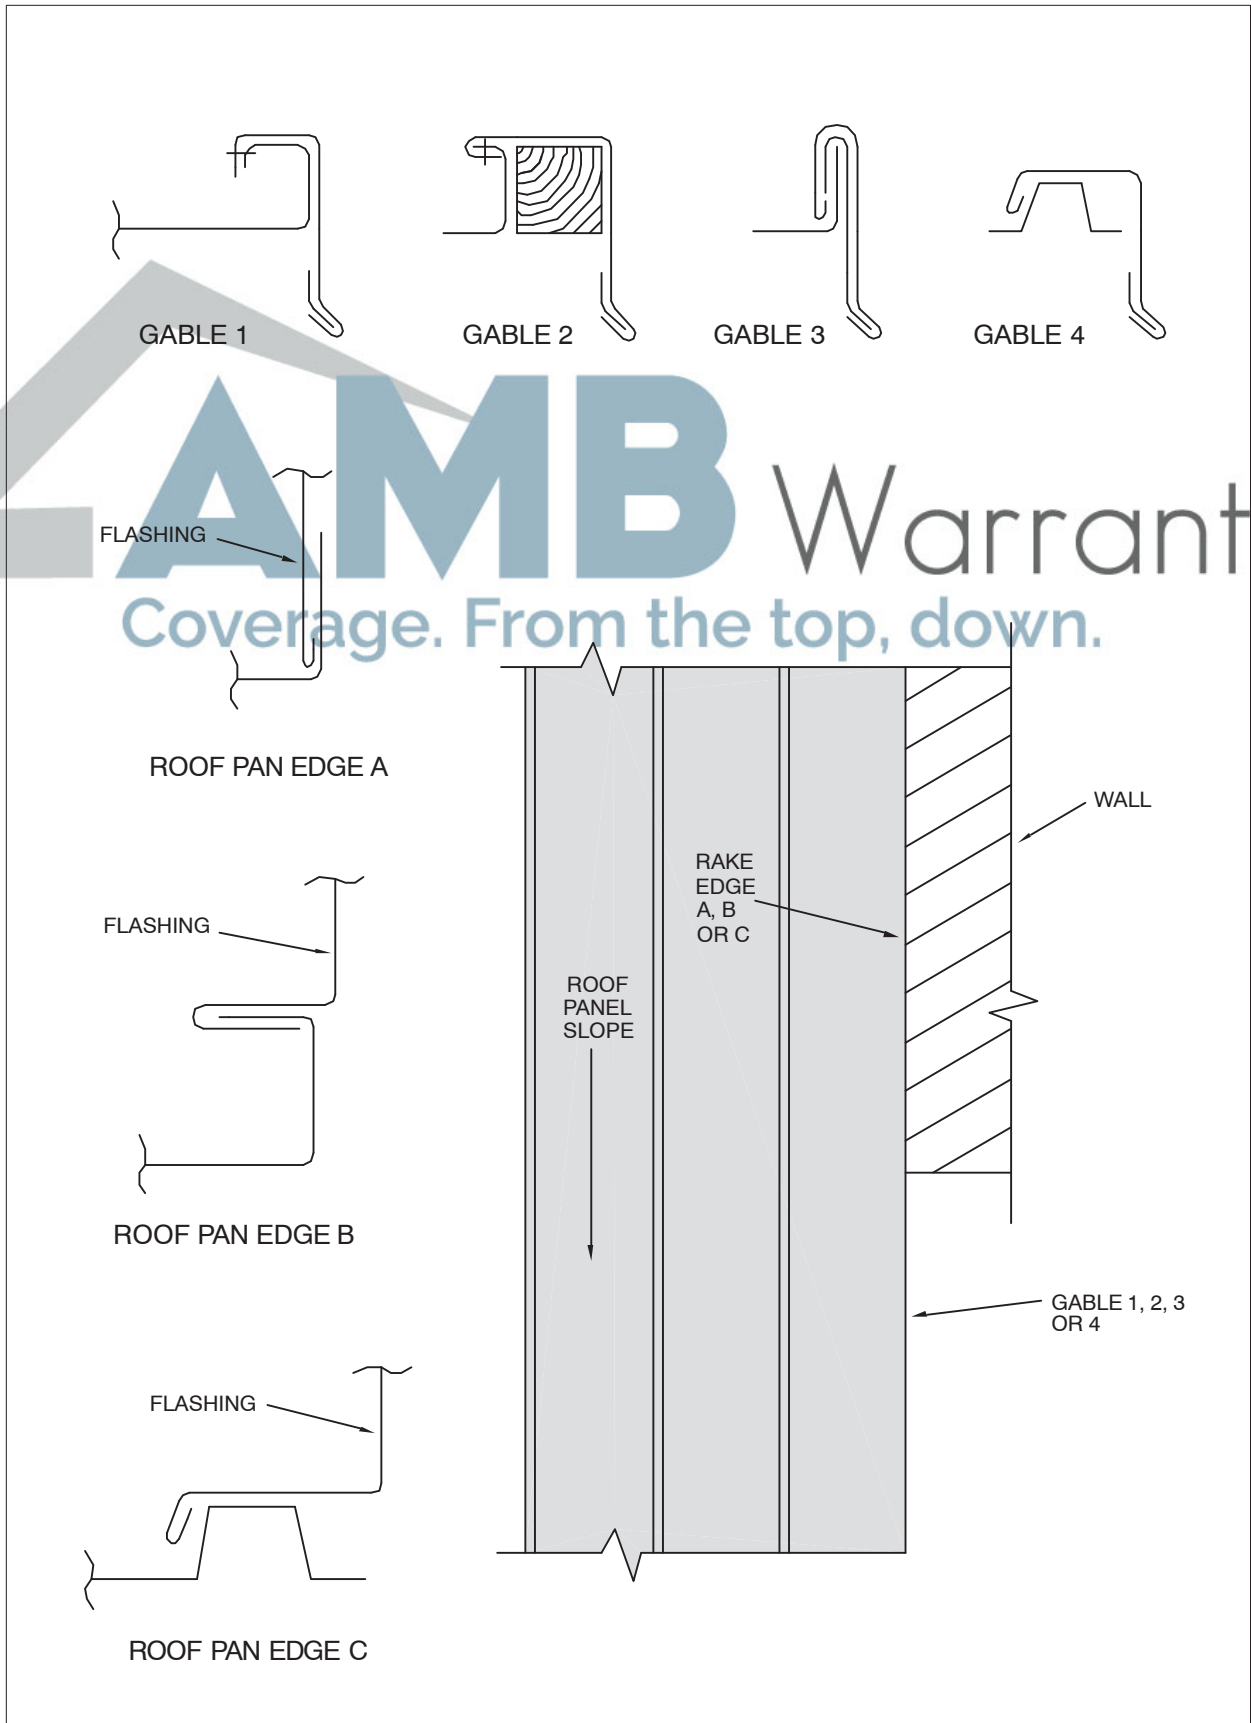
illustrates several ways of flashing gables and metal roofs having a sloped edge against a wall.
